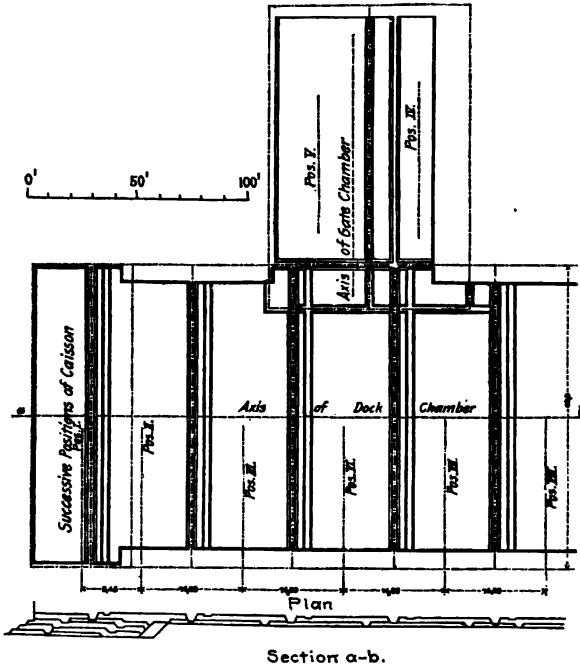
ARRANGEMENT OF SINGLE SECTIONS OF CONCRETE.
